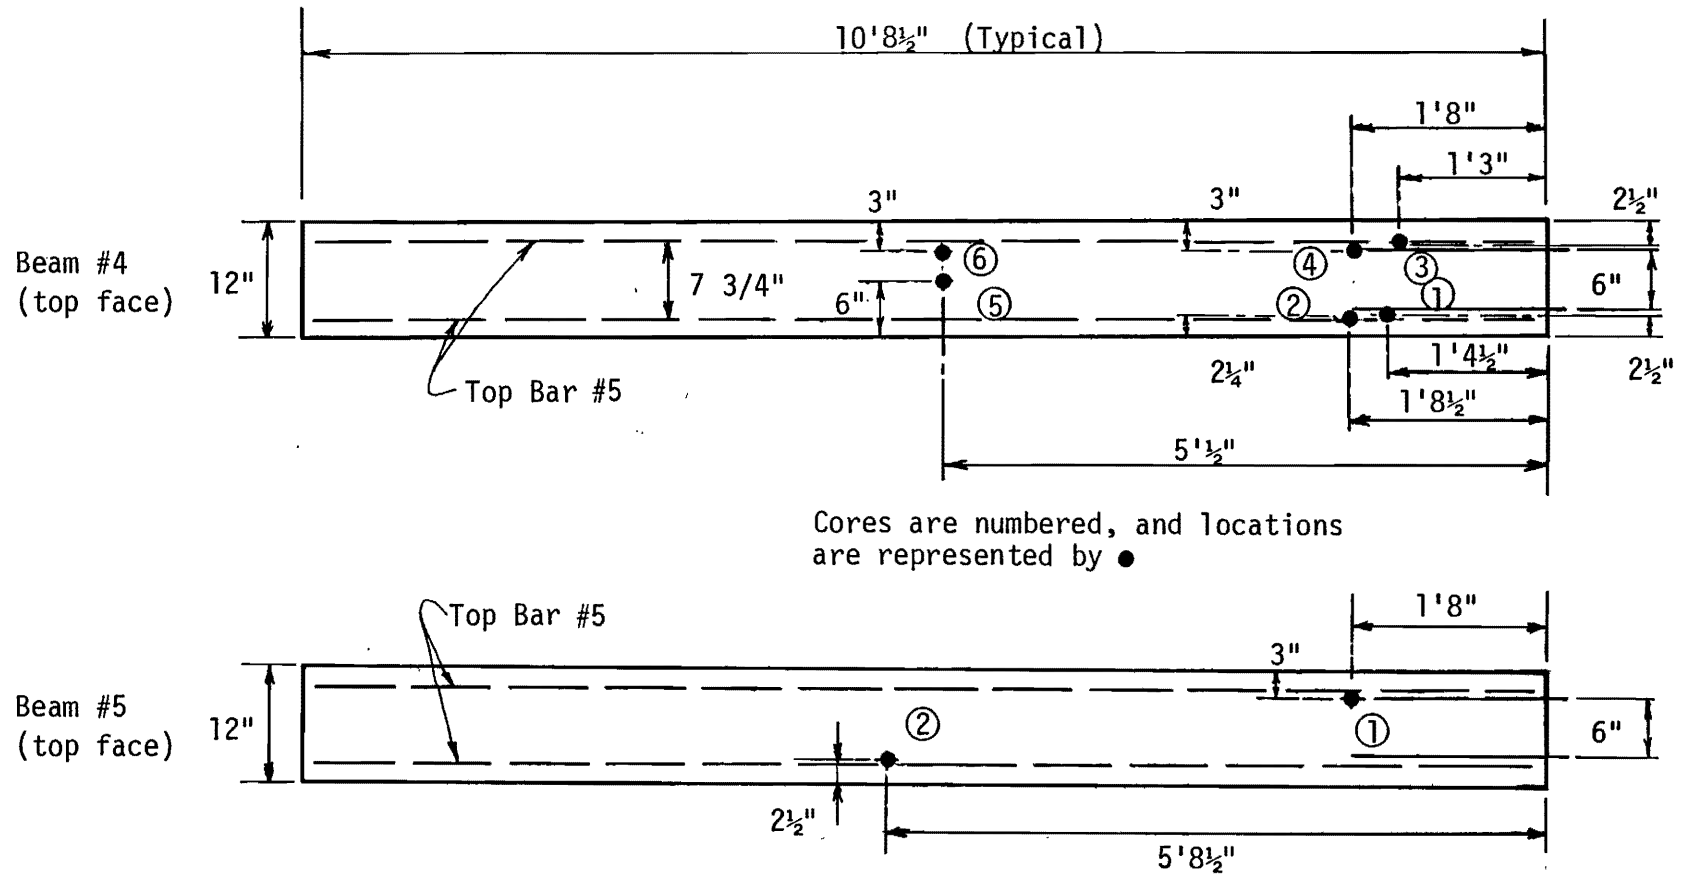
Locations of Drilled Cores along Test Beam #4 and #5.
